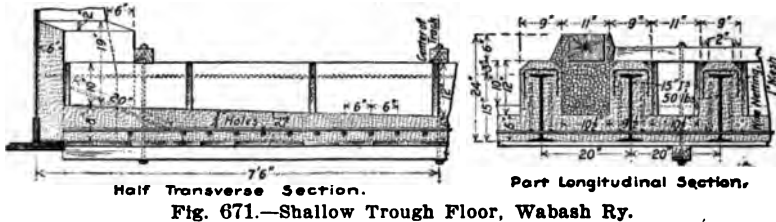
Shallow Trough Floor, Wabash Ry.
